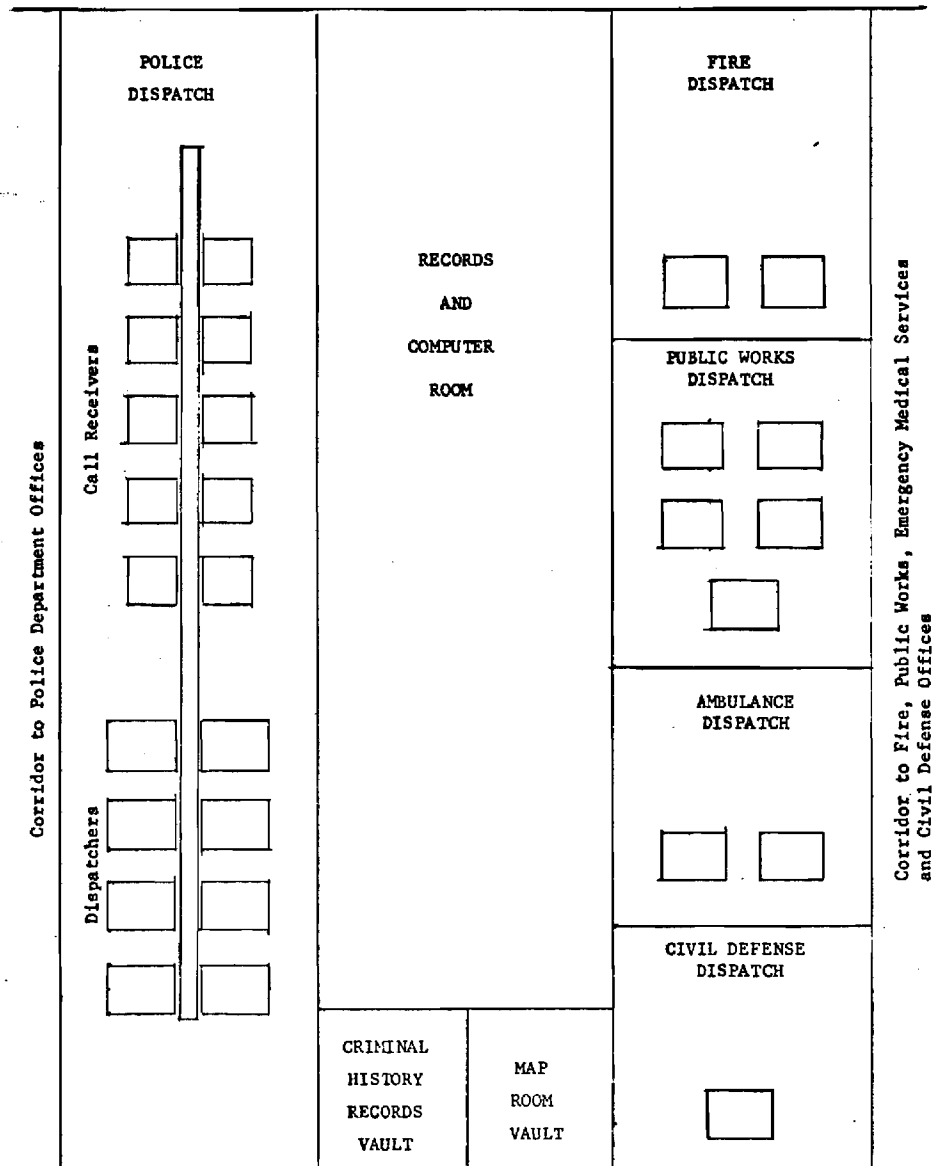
First Floor Conceptual Plan for a Metro Savannah Consolidated Command and Control Center.
